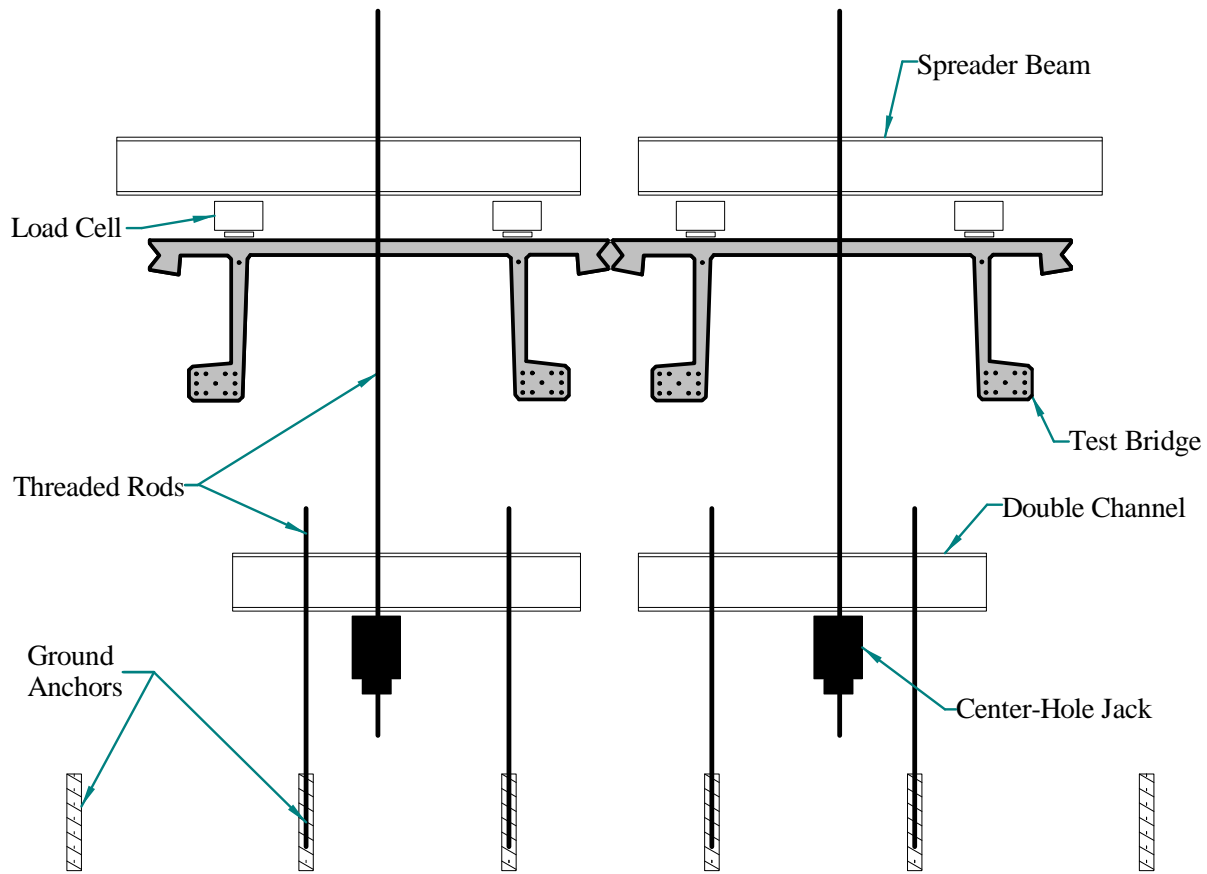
Illustration. Cross-section of loading setup near midspan of test bridge.
